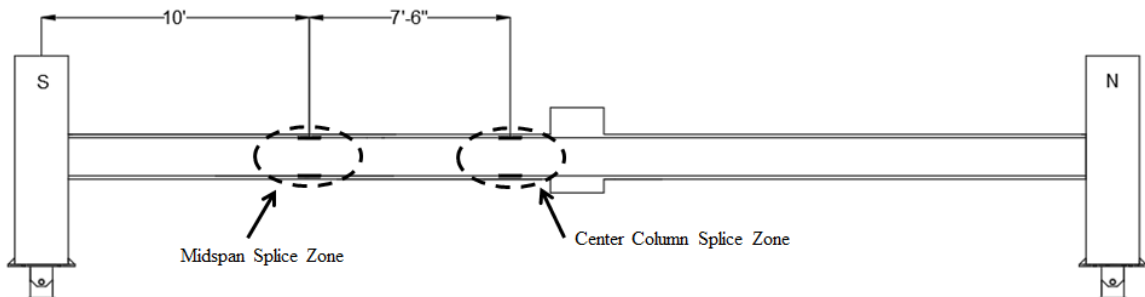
Location of sections instrumented using strain gauges (Specimen 3)
